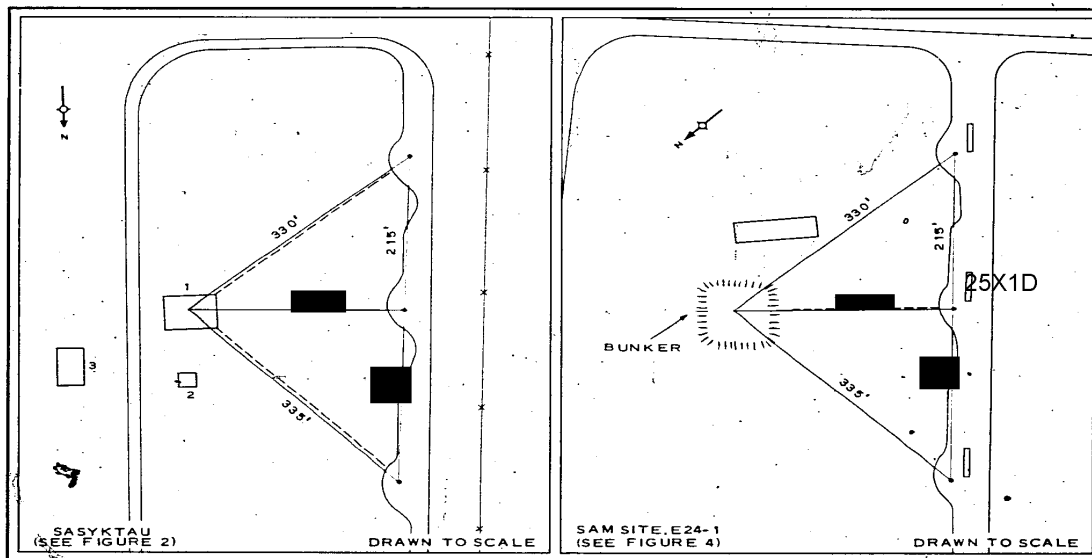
LAYOUT OF THE WESTERN LOOP ROAD OF THE SASYKTAU MISSILE-LAUNCH FACILITY AND PART OF THE MOSCOW SAM SITE E24-1.
